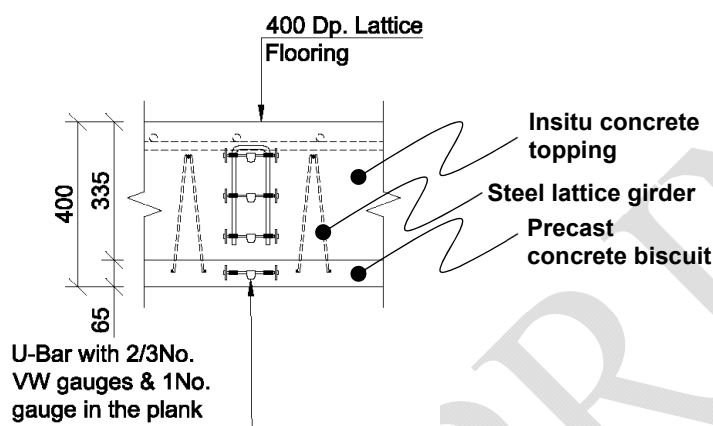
Typical section showing locations of vibrating wire gauge installed in the flat slab system.
